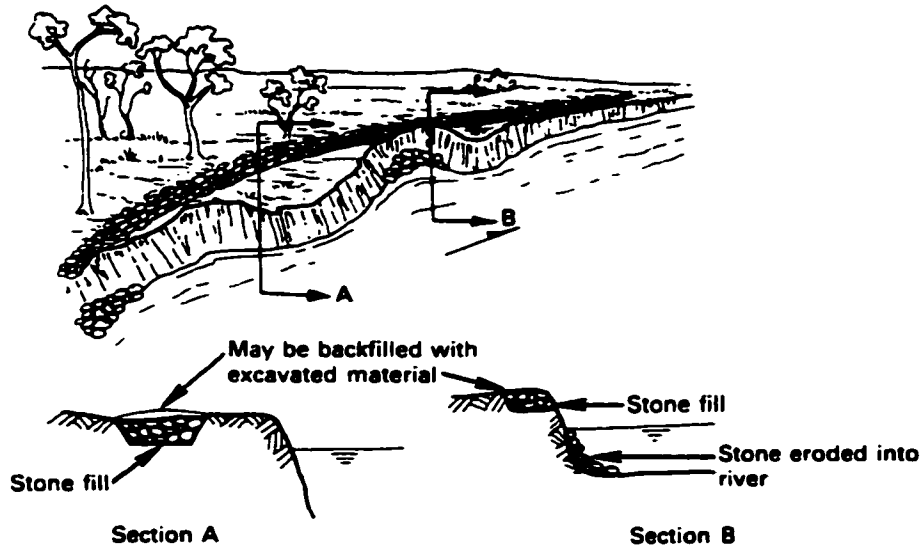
Standard rock-filled trench with cross-sections (Petersen, 1986).
